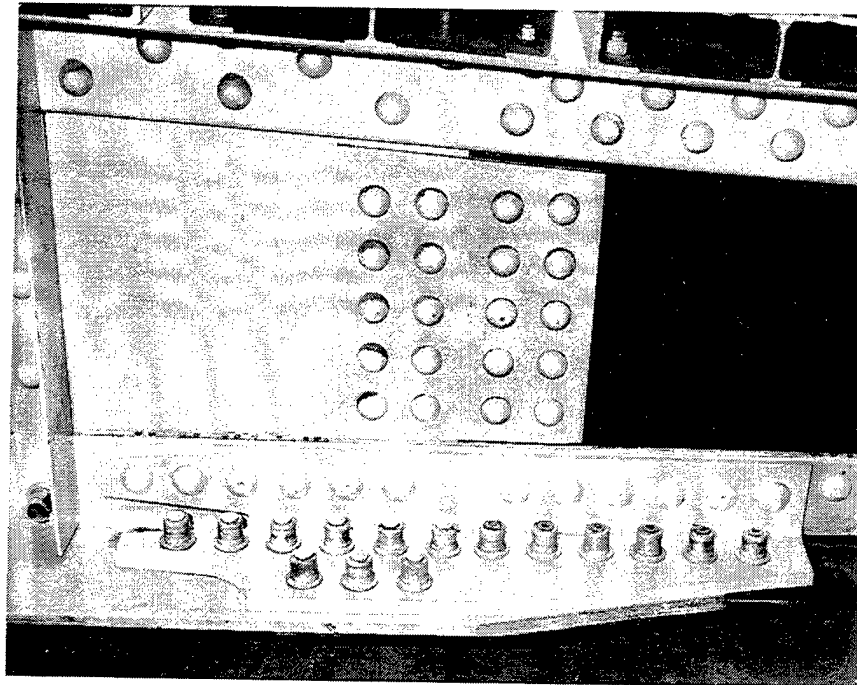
Close-up view of the modified larger angle splice fastened to the bottom chord angles and girder plates at the spliced joint. This is where the steel ramp end section (dark area at right) was spliced to aluminum section on left. It was made of stronger alloy 7050, and the Huckbolt fasteners were used as seen with the flanged collars. There is no sharp notch in the new angle splice as was seen in the original splices that sometimes were cracked (see Figures 2 and 120).
